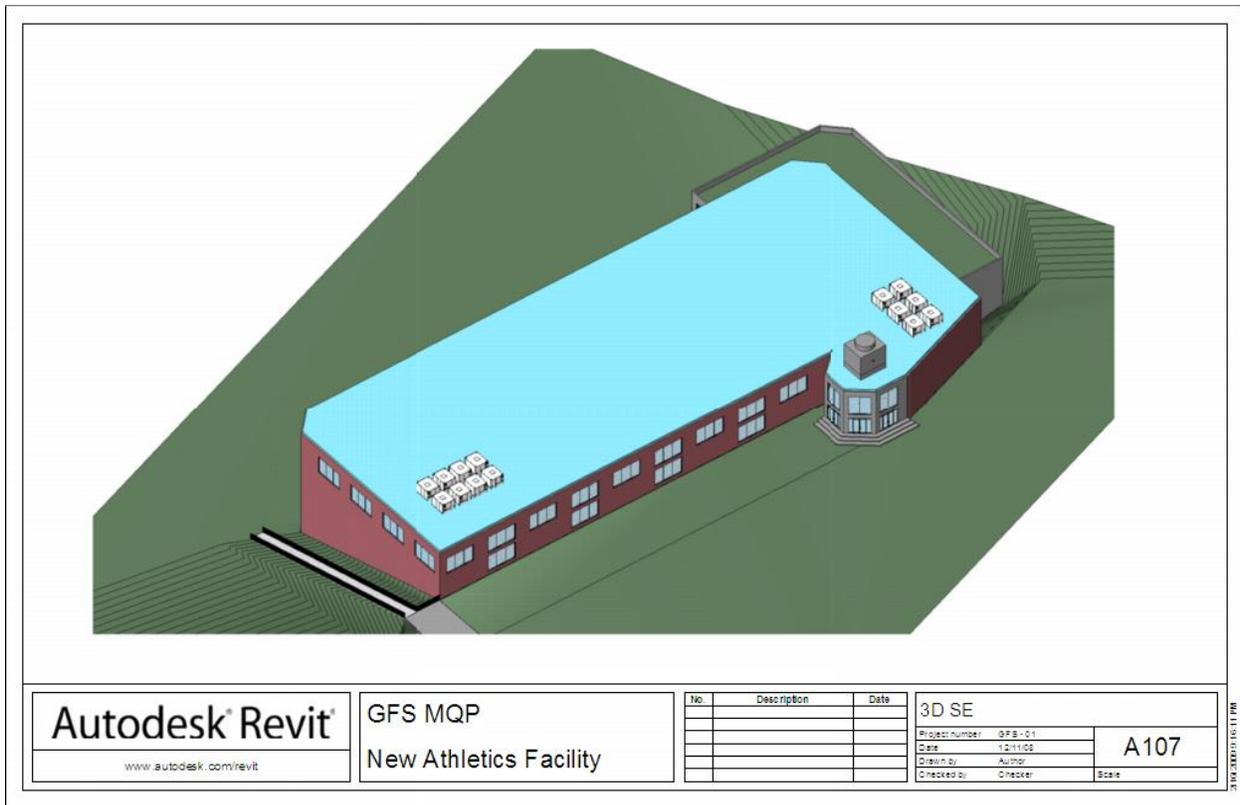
Solar Panel Roof Space (Highlighted in blue)
